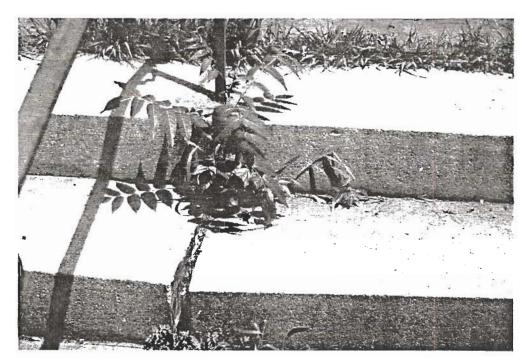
Stone Site Entry Stair Detail at South Entrance.
